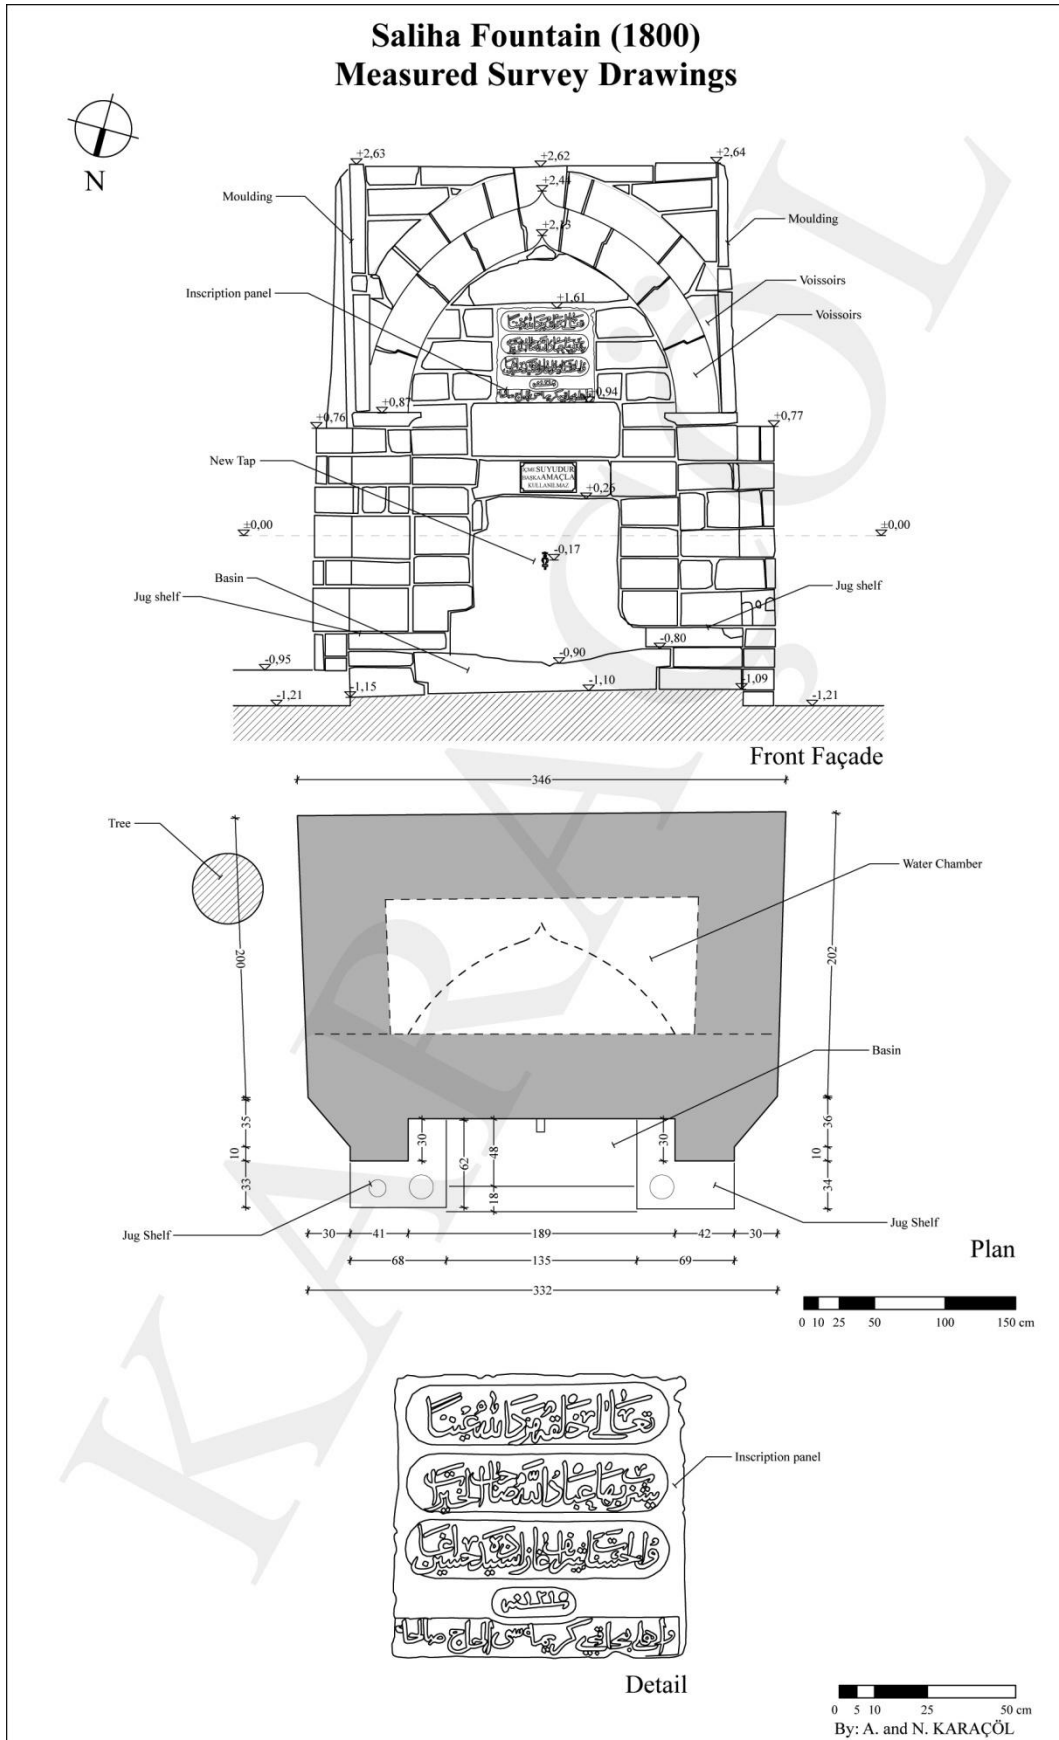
Saliha Fountain front façade, plan and detail drawings
